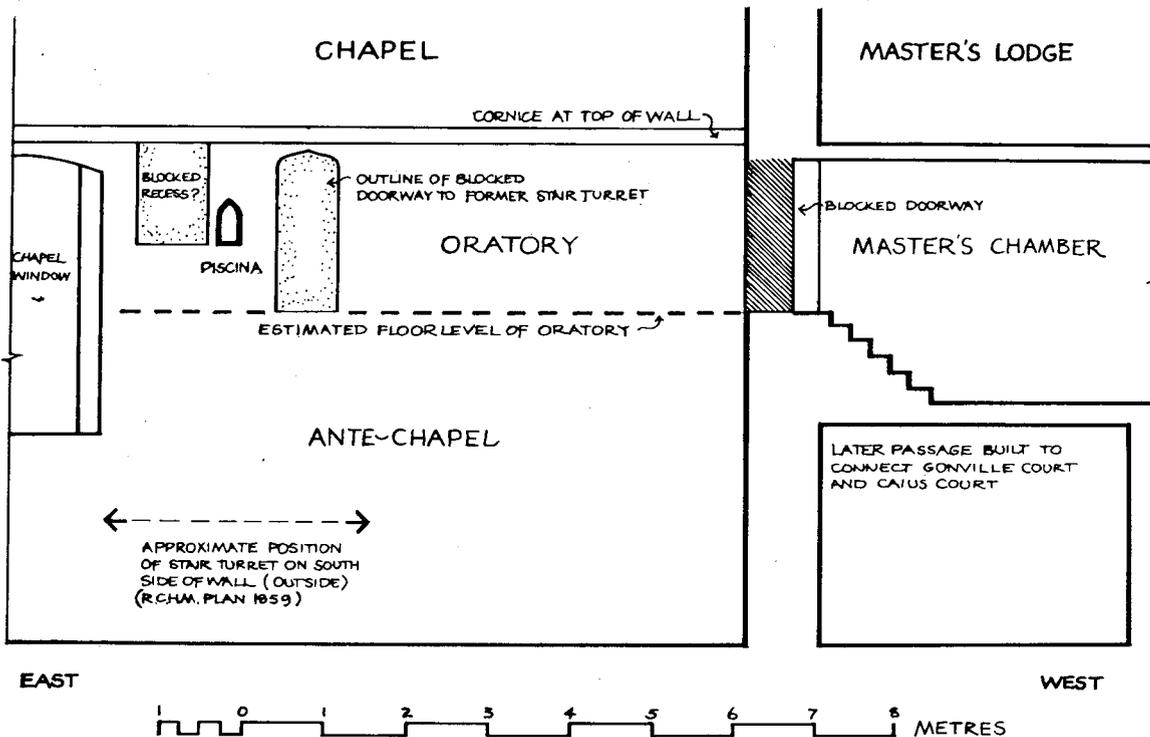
Section through west end of Gonville and Caius College chapel, showing connecting door at first floor level and details of 15th-century oratory.
